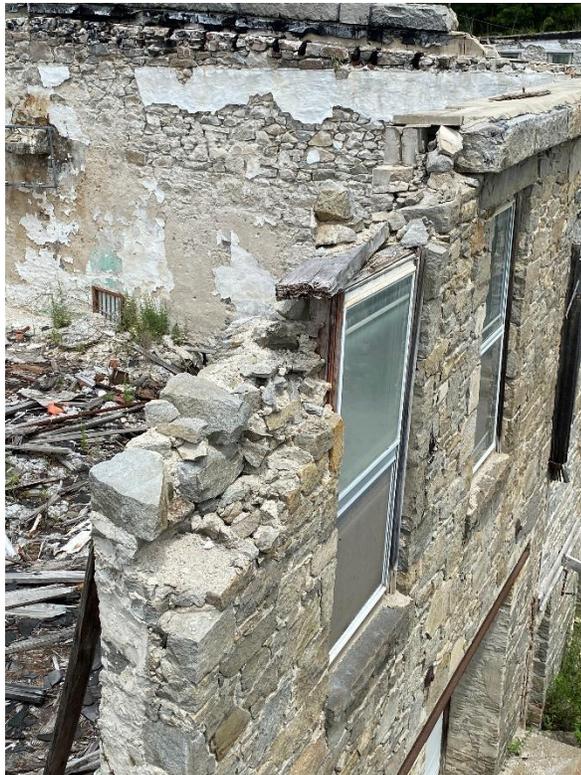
of 4 – Partial up-close view taken from the lift showing the collapsed wall on south elevation adjacent to the South Wing. Note the loose materials and debris that pose as potential fall hazards.
